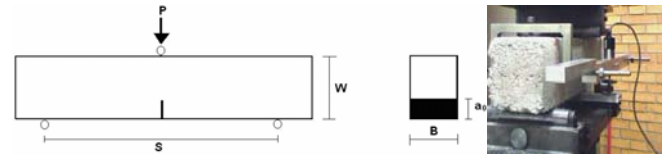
Arrangement for Fracture Tests with RCC Specimens.
